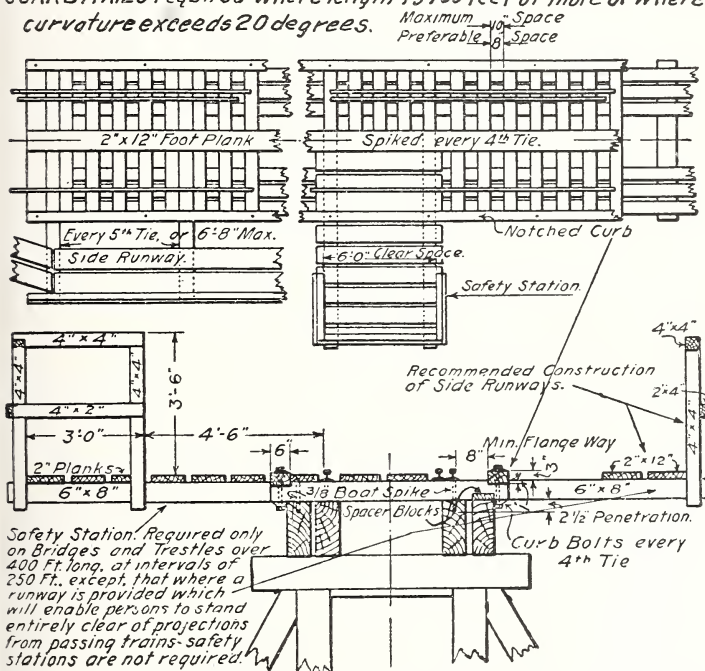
Minimum requirements for deck construction of bridges and trestles.
